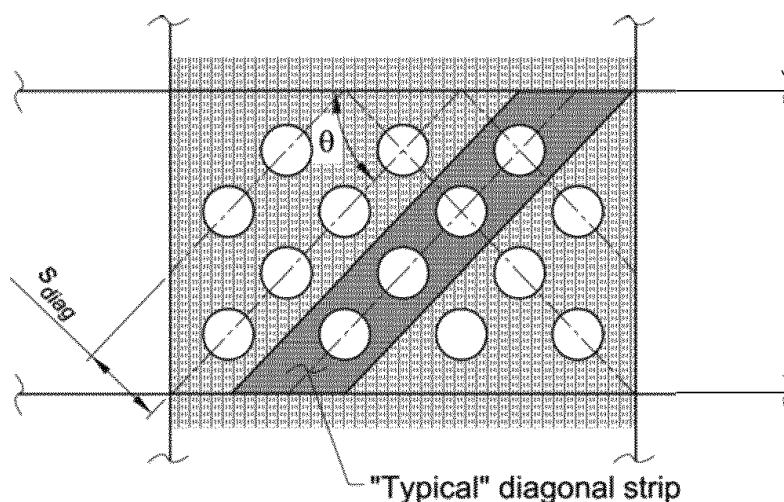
Schematic detail of special perforated steel plate wall and typical diagonal strip.
